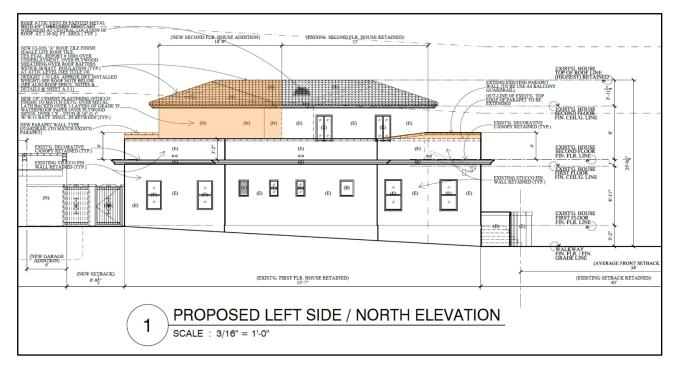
North elevation of proposed development with additions shown in orange (View from 520 S. Sunset Canyon Drive)
